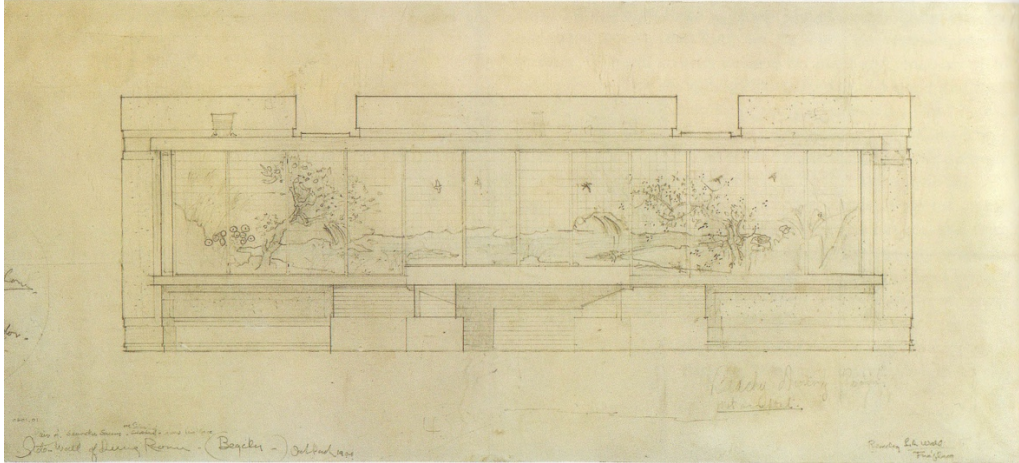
Frank Lloyd Wright drawing of mural wall for Beachy house, 1906.
